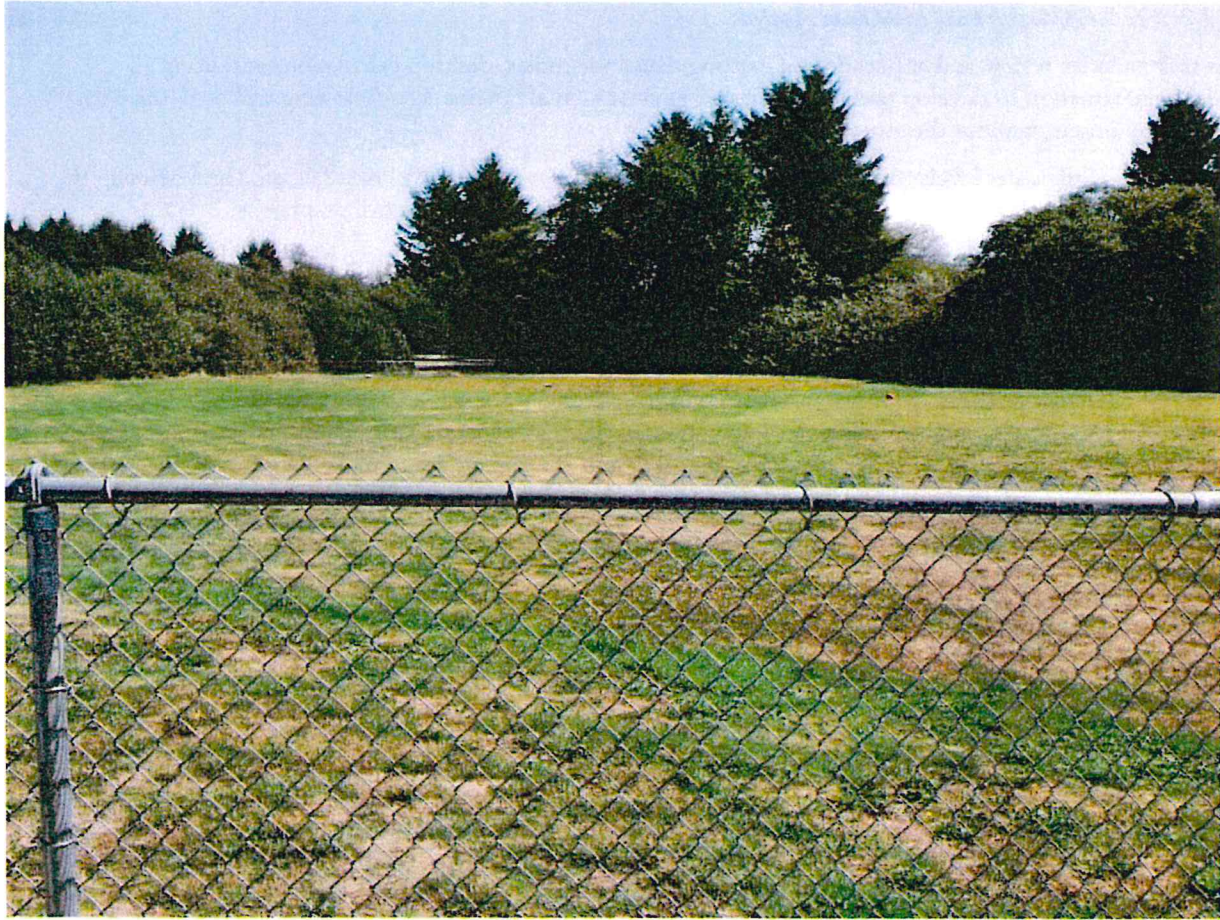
Tsunami “Safe Haven” Berm Site Adjacent to Long Beach Elementary School
